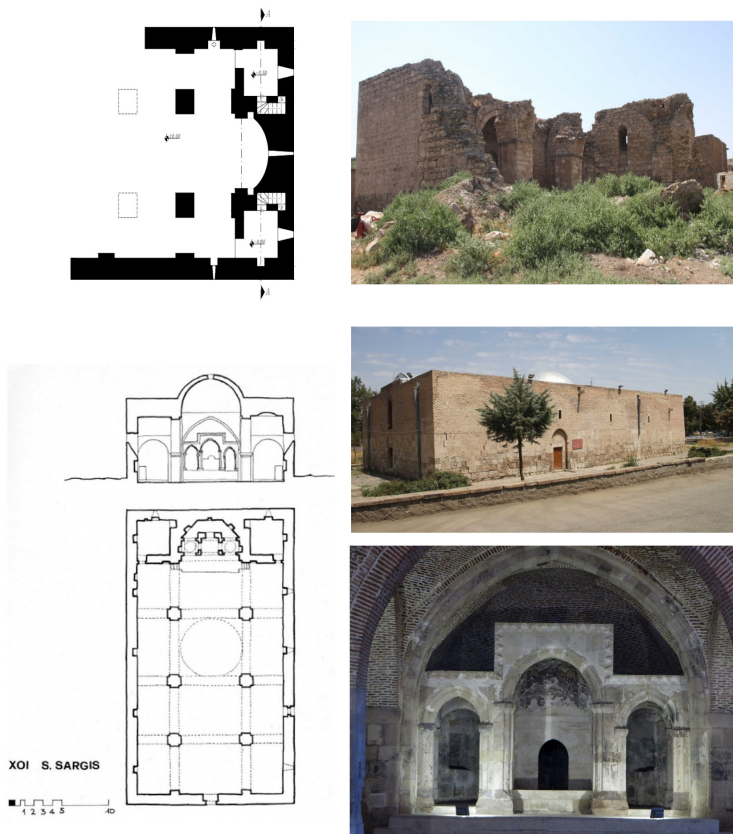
RAA Archive, Upper: Monastery of Derik (plan and exterior of collapsed remains); Lower: St. Sargis Church (plan, section, and exterior/interior views). n.d. Photographs and drawings. Salmast and Khoy, Iran. RAA Archive, copyright
